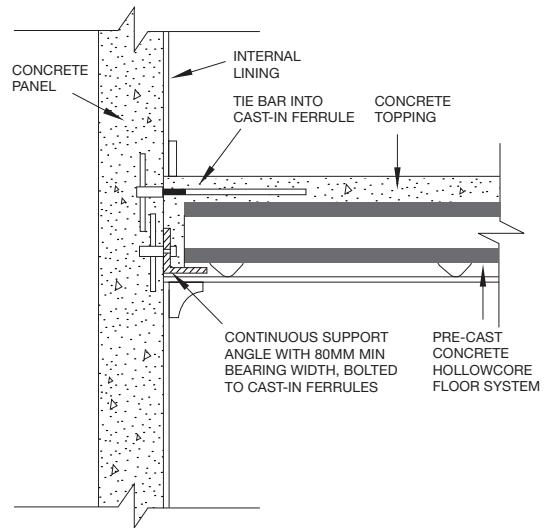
Panel to Suspended Precast Concrete Floor Connection. (Precast Hollowcore floor supported by shelf angle fixed to wall panel via cast-in ferrules)
